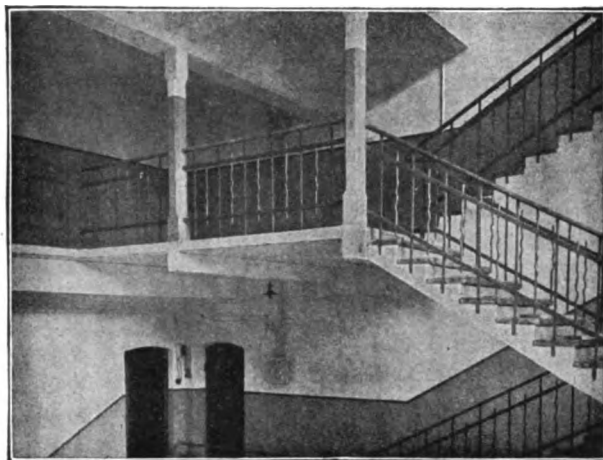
Reinforced concrete stairs with suspended platforms in the brewery in the English Garden in Stuttgart.
